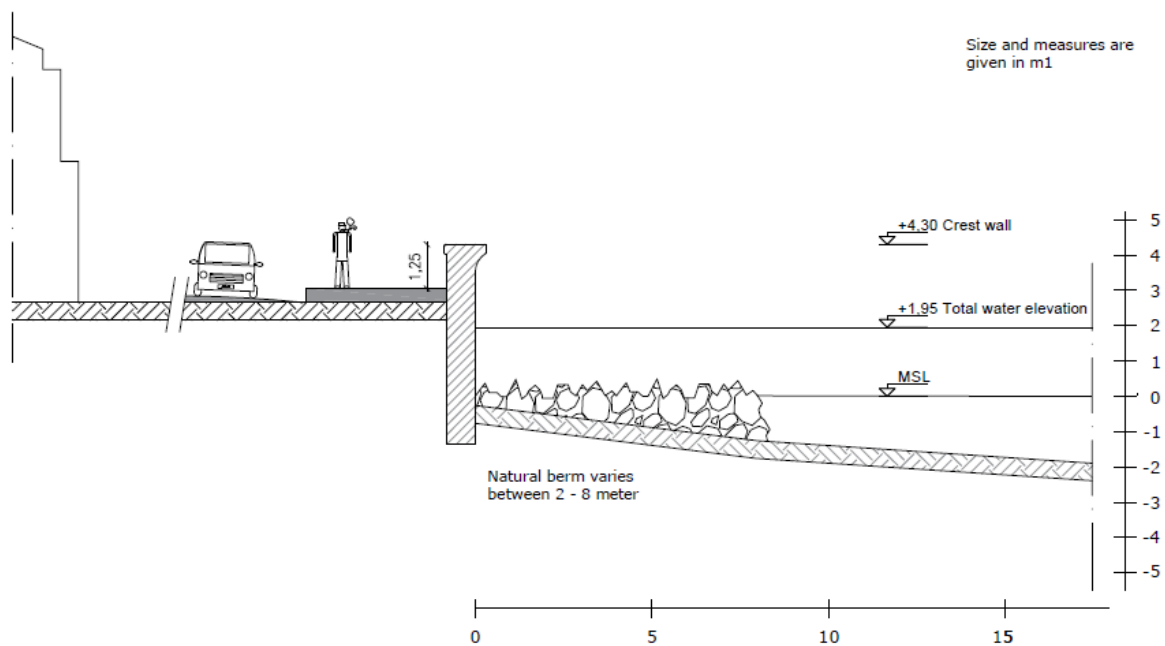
Detailed design for section 3.2, 3.3, 3.4, 5.1 and 5.2
